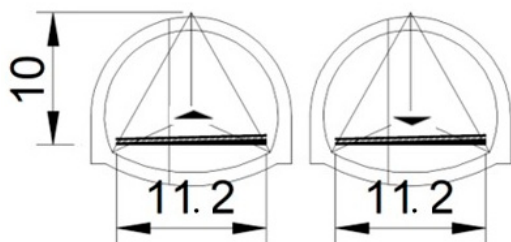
Modeled section of a natural tunnel in traditional excavation for the two directions—typical section of the intrados (m).
